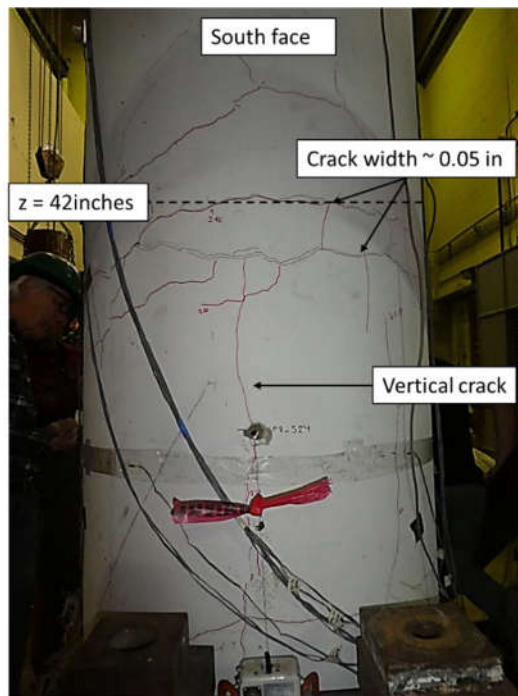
Horizontal and vertical cracks on south face, Series 6
